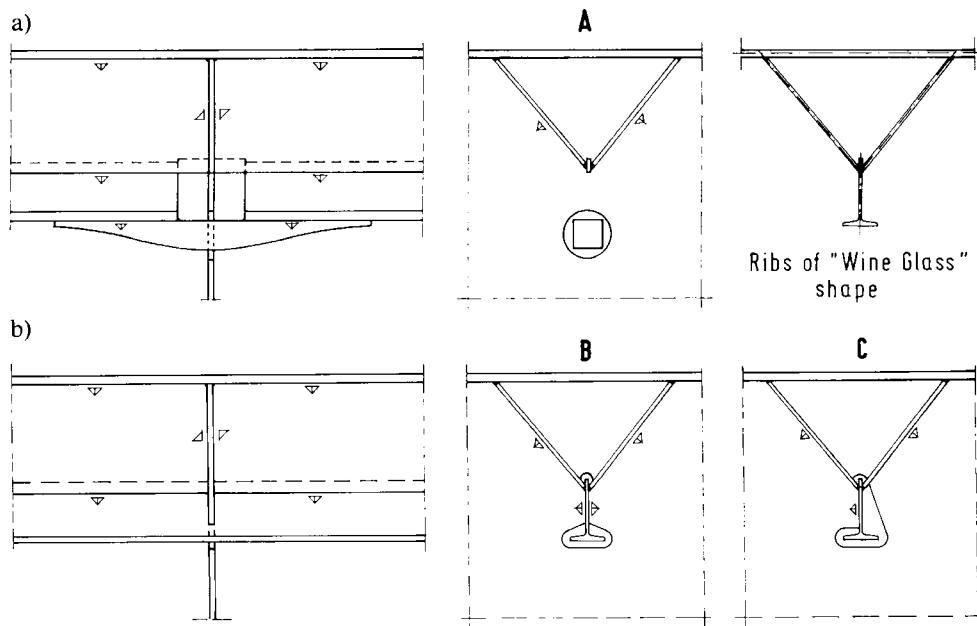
Haseltal bridge: Reconstruction of the connection of V-stiffener to cross beam
